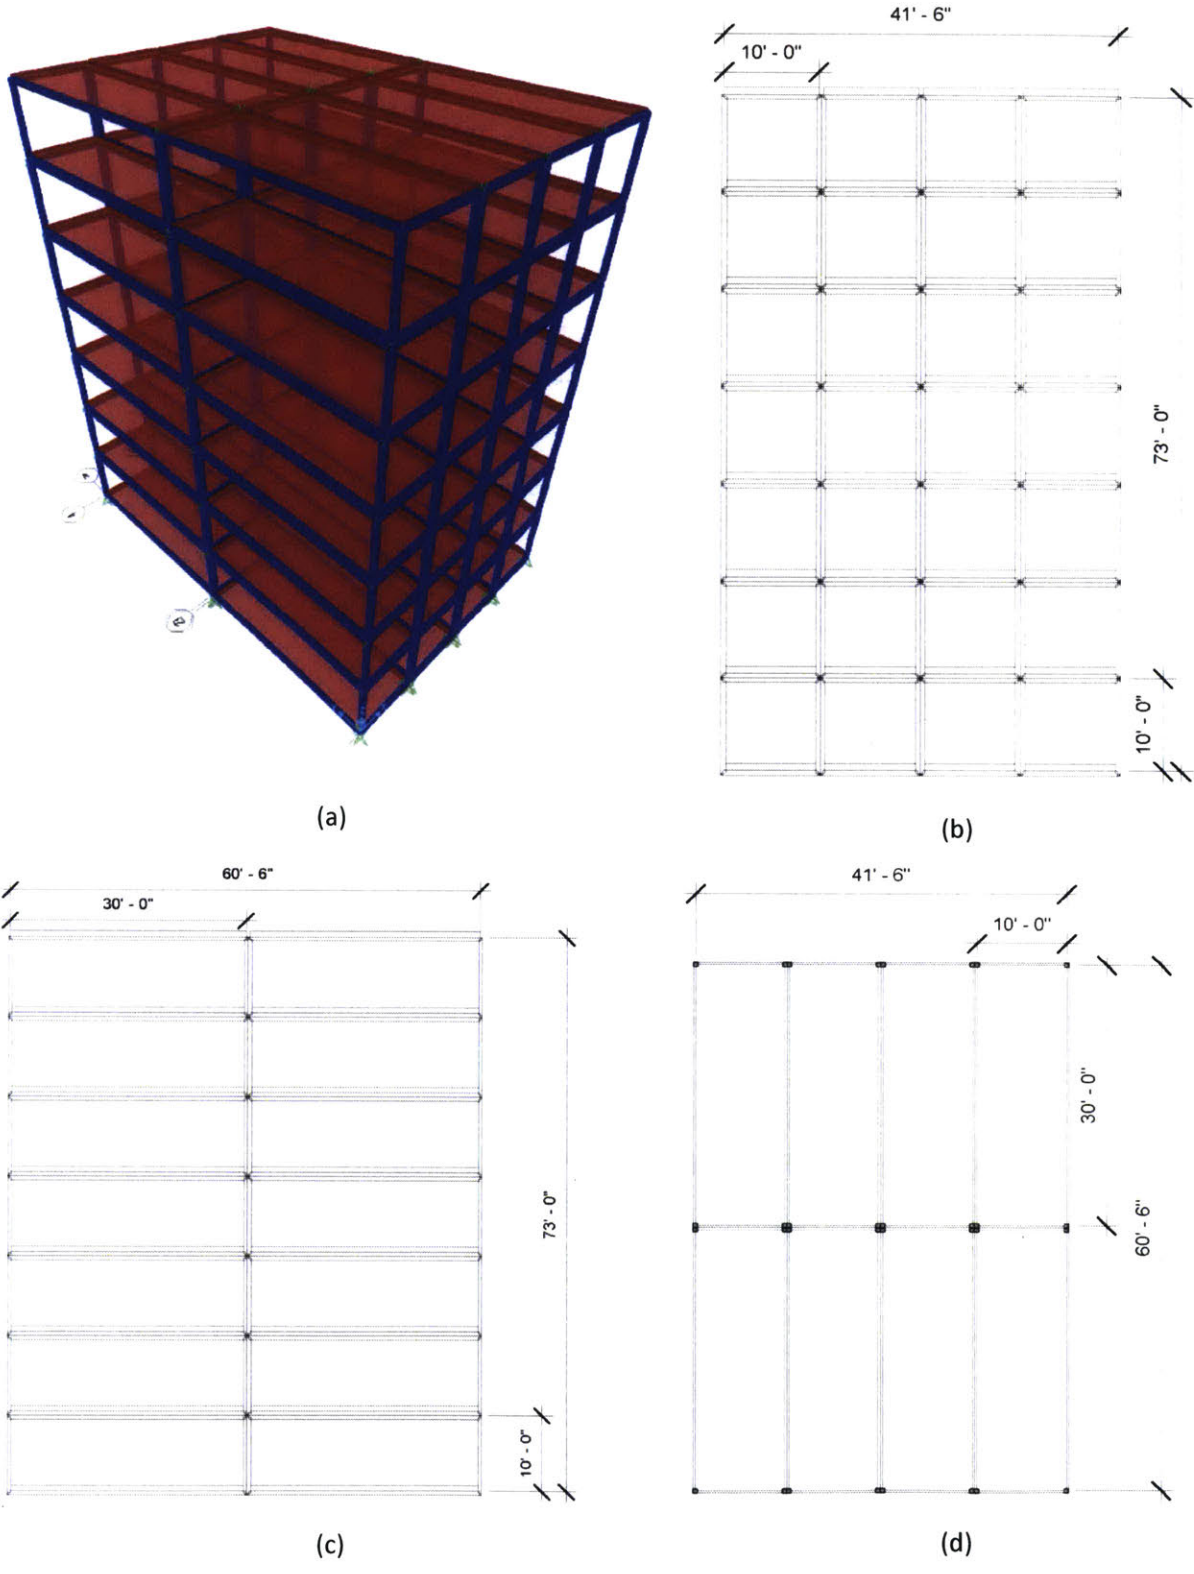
3D FINITE ELEMENT MODEL FOR 7 STORY STRUCTURE. (A) ISOMETRIC VIEW (B) FRONT ELEVATION (C) SIDE ELEVATION (D) LONGITUDINAL SECTION VIEW
